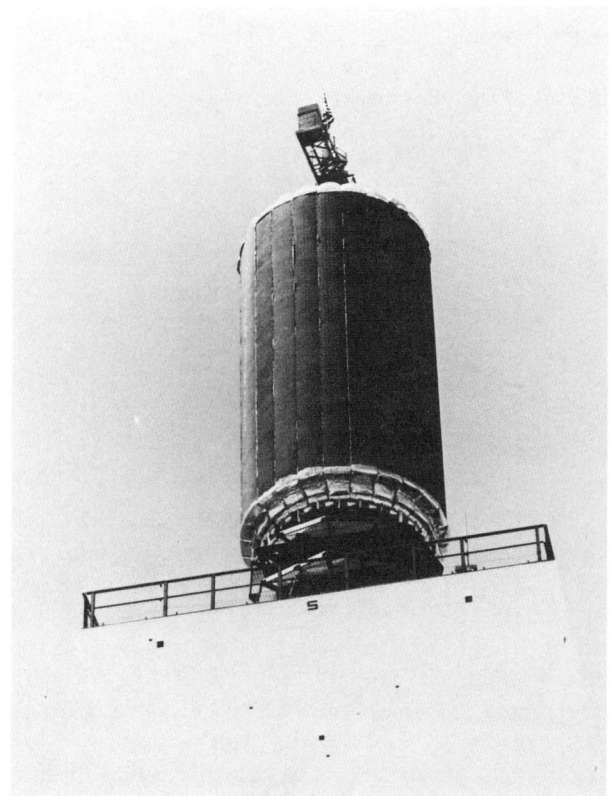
10-MWe Plant Receiver Under Construction, July 1981
